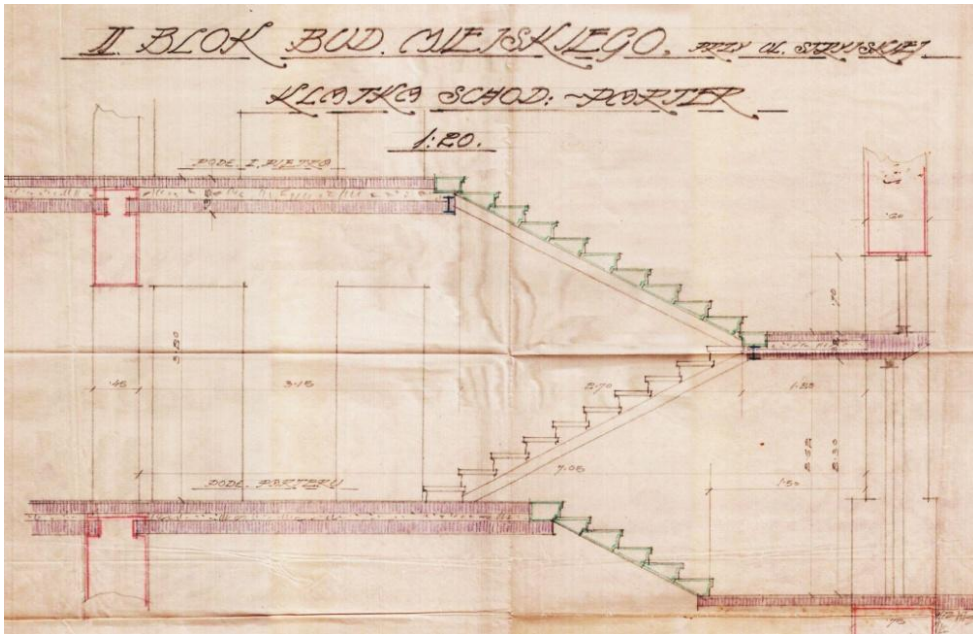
Project detail. Section through a fragment of the stairwell of Building No. 62 on Stryiska Street.
